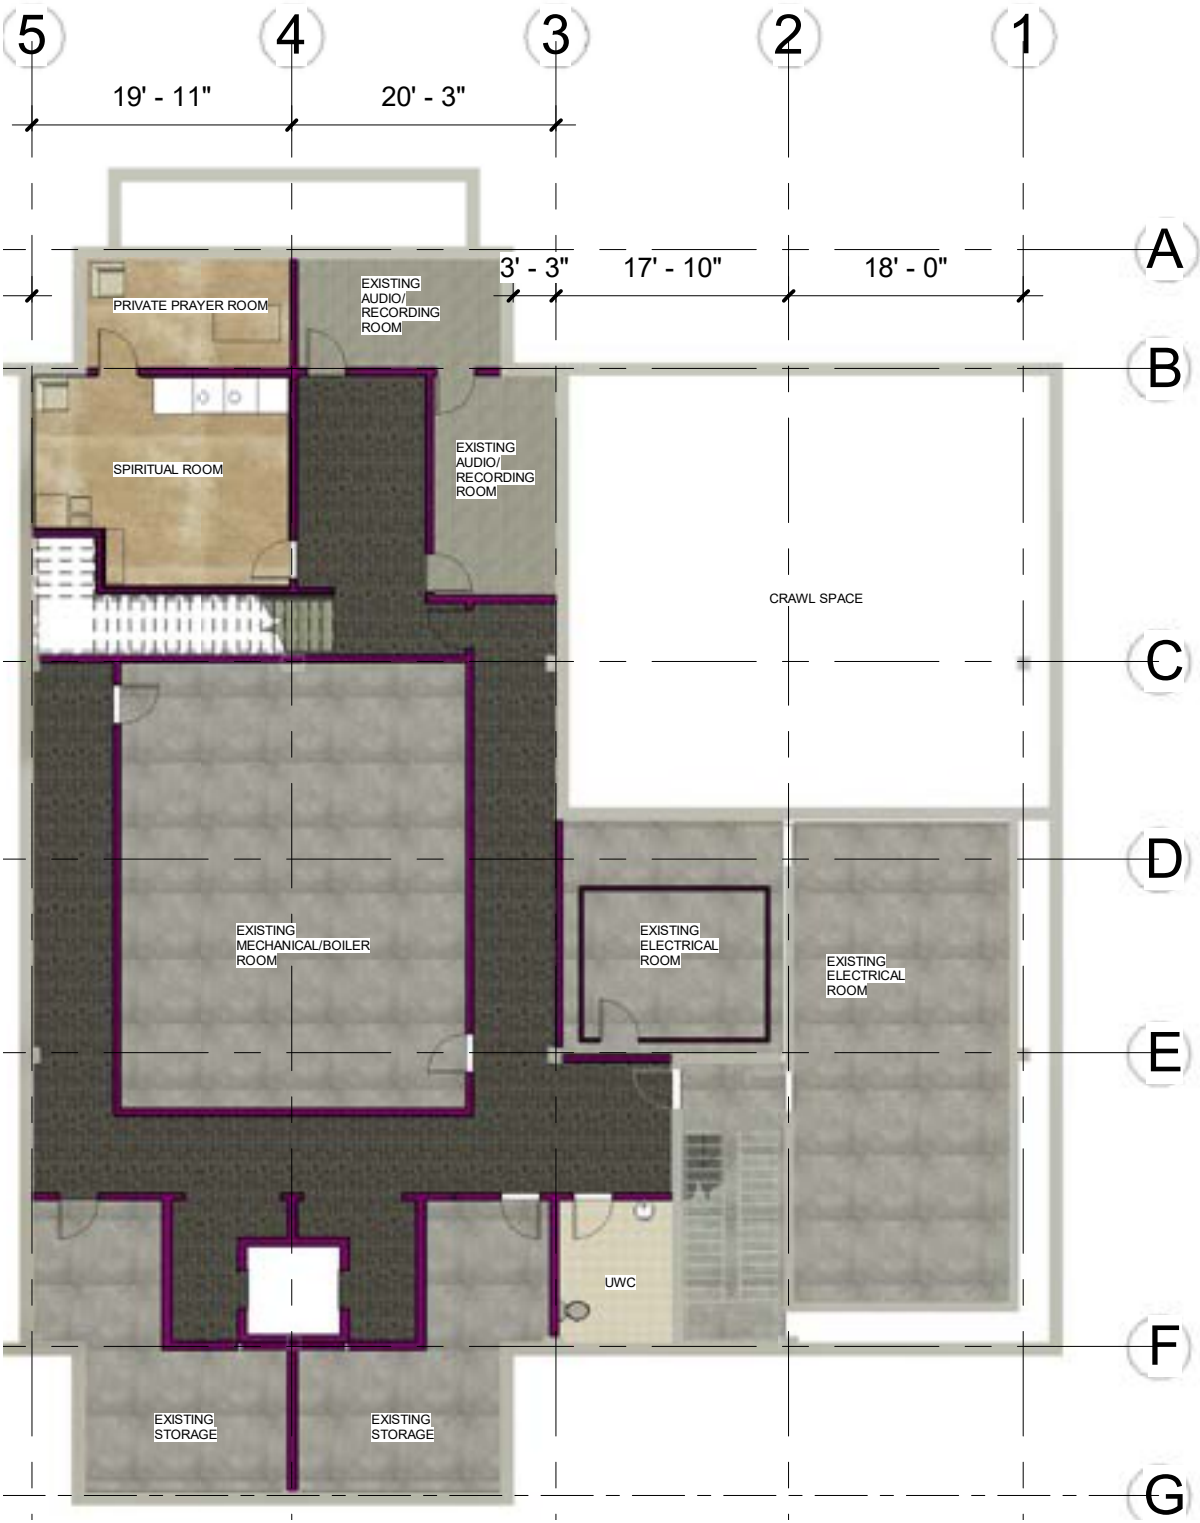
PARTIAL BASEMENT FLOOR PLAN - NTS
